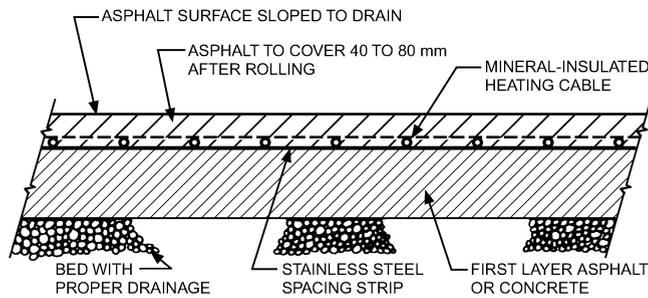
Typical Section, Mineral Insulated Heating Cable in Asphalt
